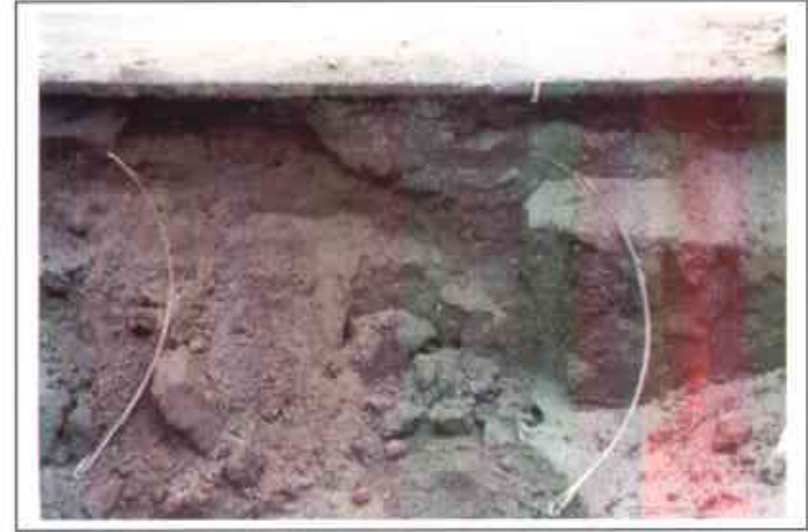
Location of soil sample taken at southeastern central end of excavation (Location ID 1, Figure 2).
